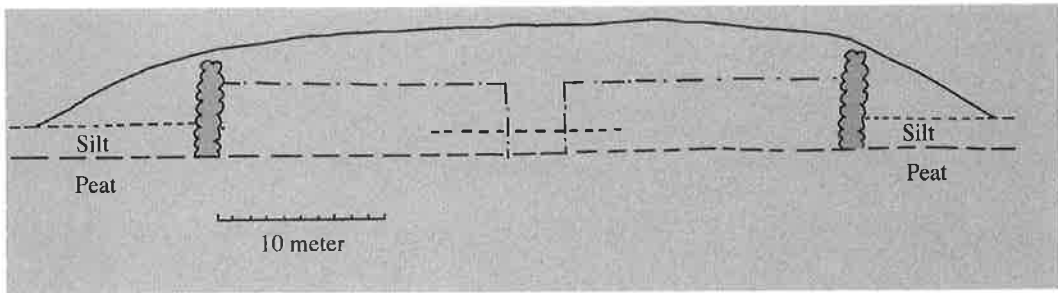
Section of the motte and the supporting walls. No supporting timber has yet been found under the walls.
